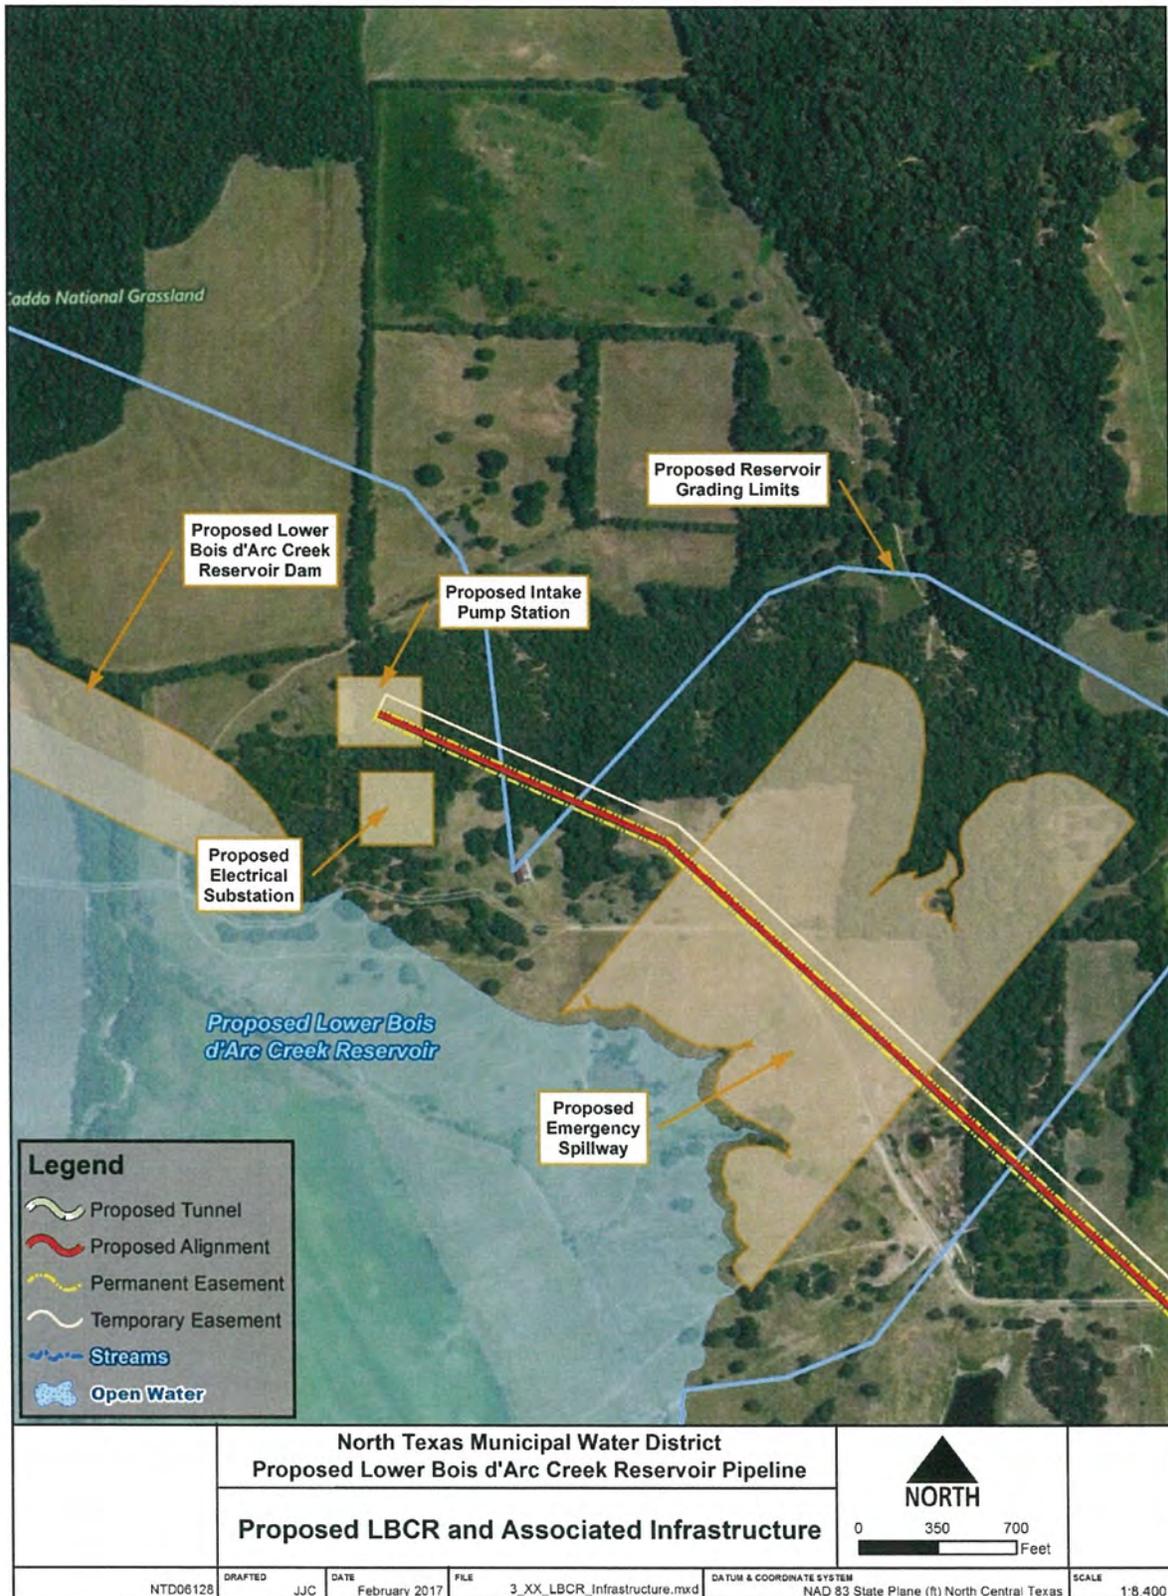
Location of Proposed Intake Pumping Station and Electrical Substation
